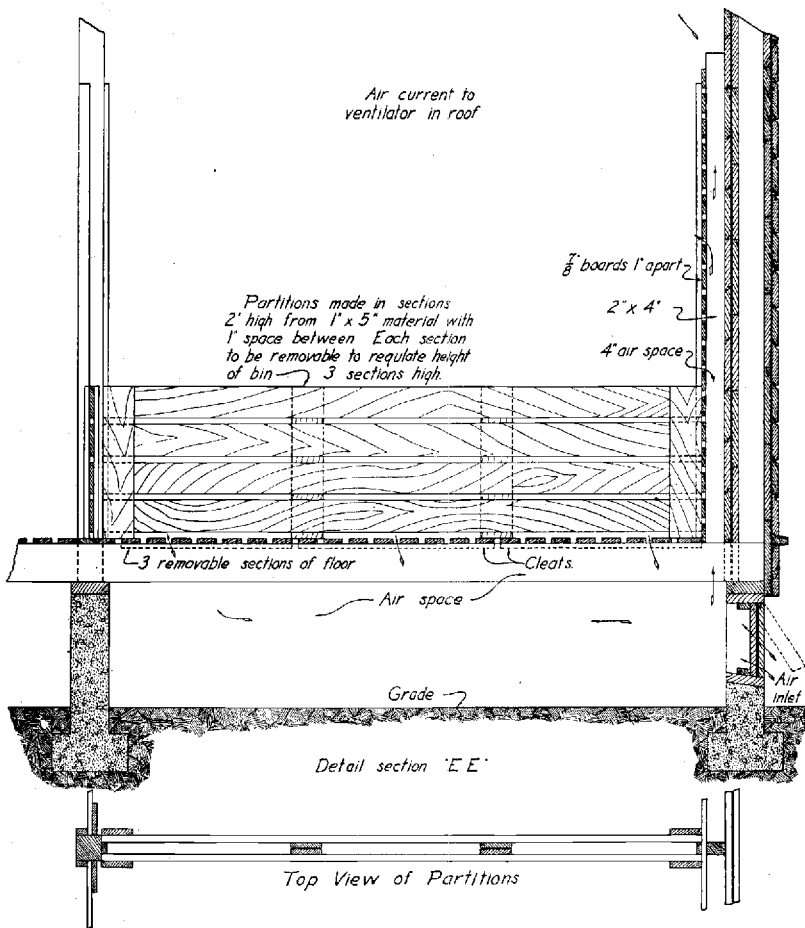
Section of potato bin showing one plan for the construction of the slatted walls, floors, and bin partitions to give good ventilation, which is so much desired in potato storage.
